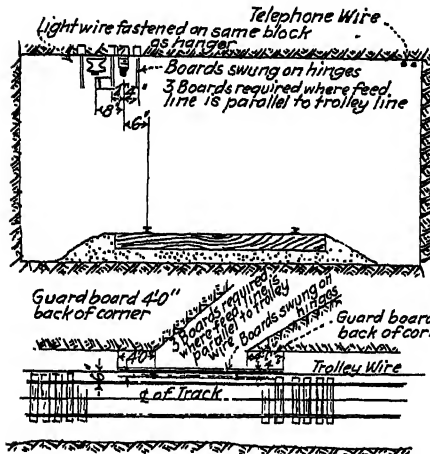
STANDARD WIRING SUSPENSION AND PROTECTION.
